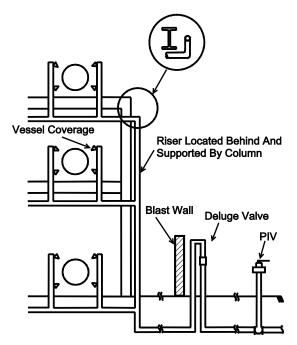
Explosion Protection Of Water Spray Or Deluge Piping. (Elevation)
